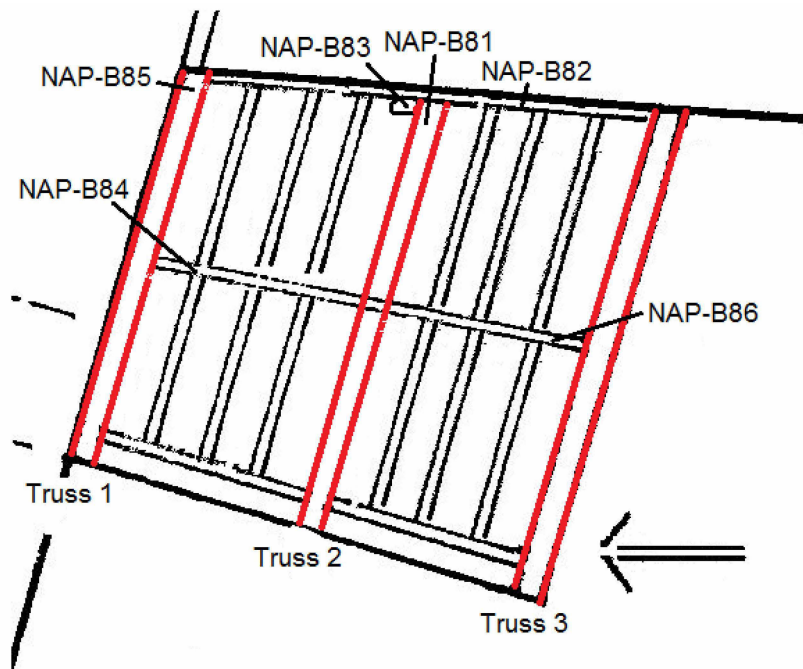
Porch roof, plan showing the location of samples NAP-B81–6 (John Warren)
